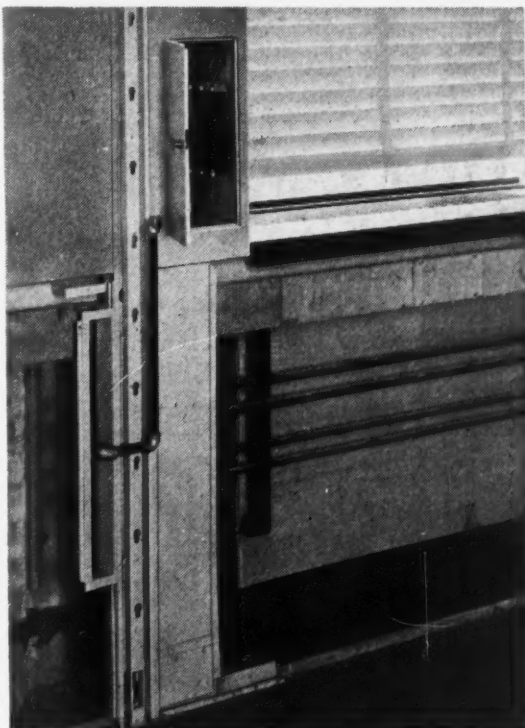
Side wall showing "shadow box" through which pipe or conduit may be brought out
